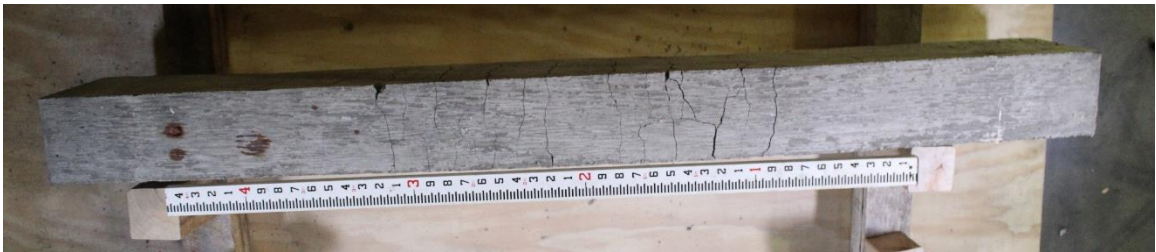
Mixture 9 (20UV) beam #30: concrete beam bottom view.
